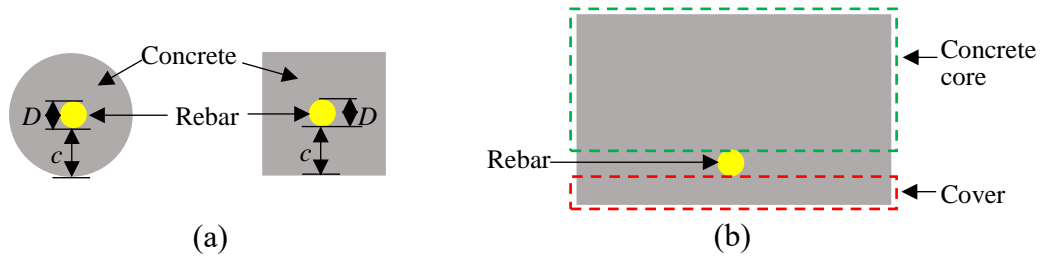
Two typical configurations for studying deterioration of concrete cover caused by corroded inner rebar (a) concrete cover specimen, and (b) cover and core specimen
